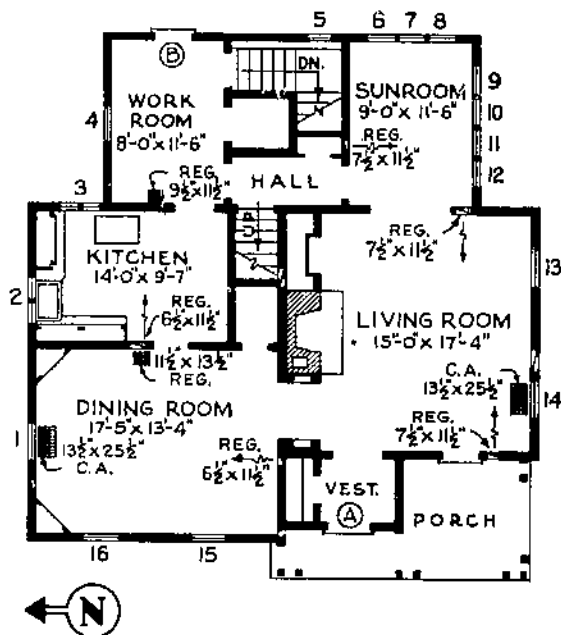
First-floor plan of house 5-R, showing location of warm-air registers and cold-air returns.
